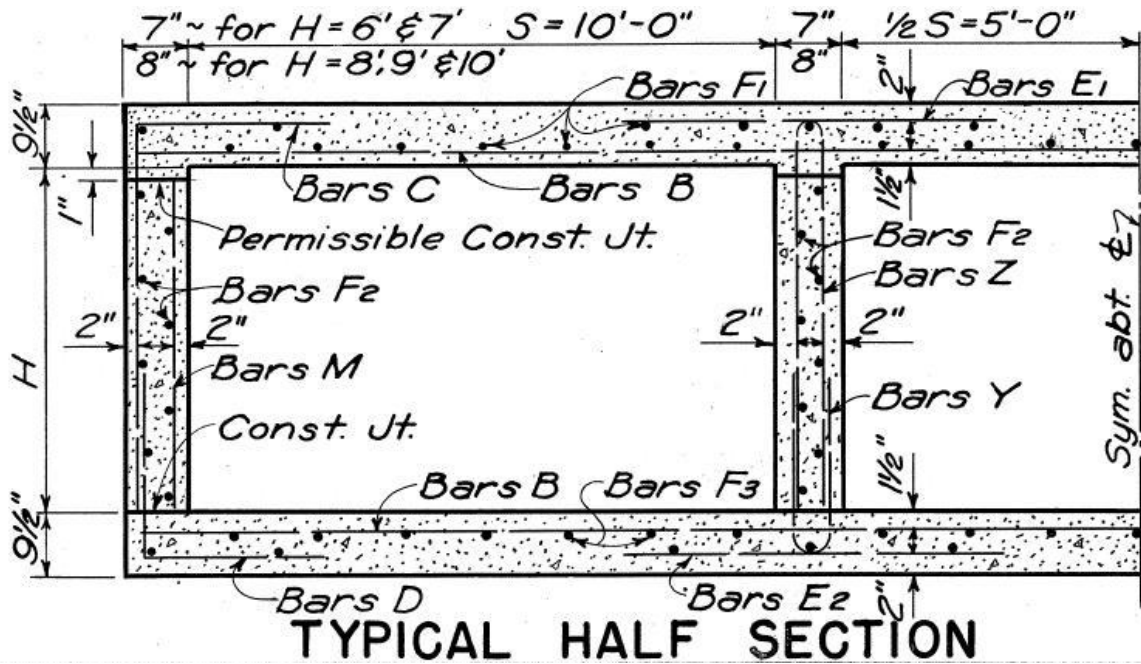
EXAMPLE CULVERT, DIMENSIONS FROM PLAN SHEET.
